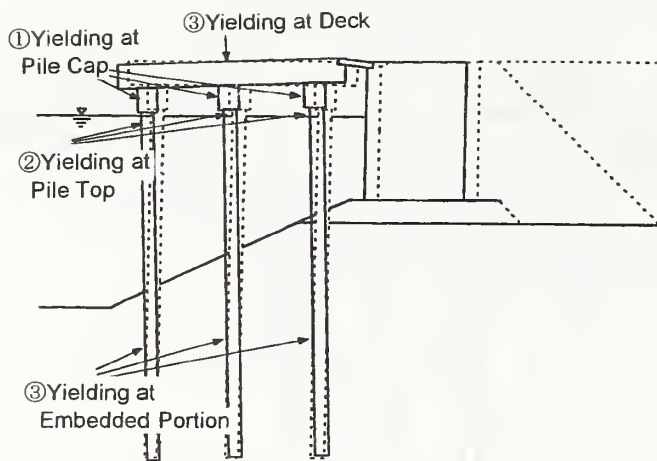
Acceptable Order of Yielding for Pile Supported Pier
